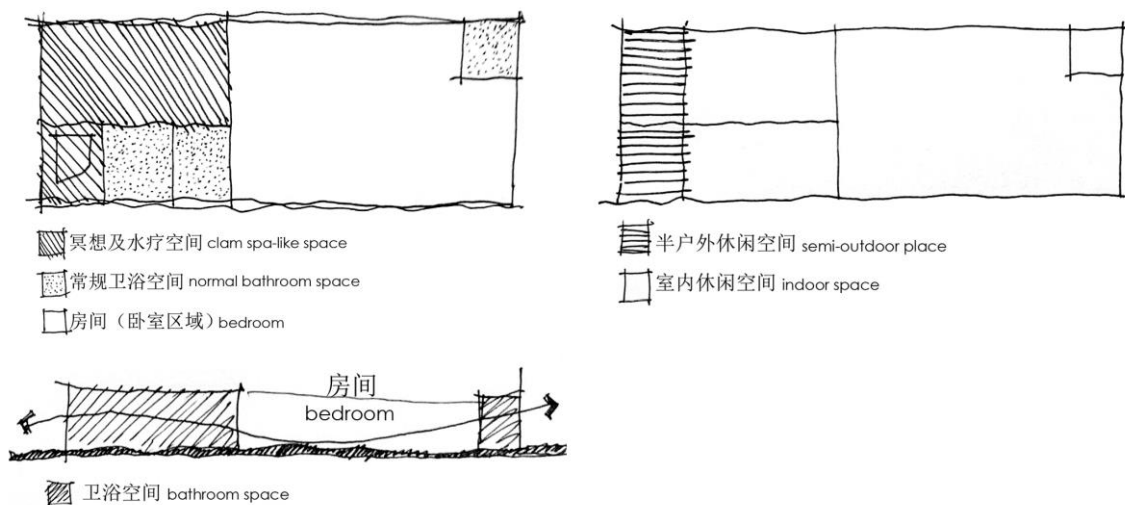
Space layout of guest room in Garden Terrace Miyazaki resort and hotel
